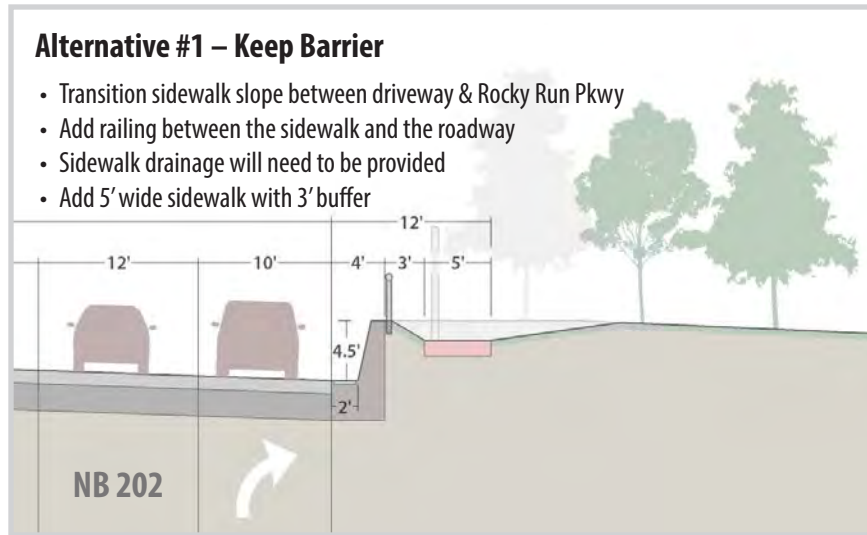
Alternative Sections for Widener Frontage Sidewalk
